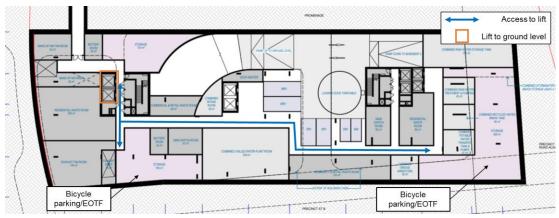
Bicycle parking and end of trip facilities - Building 2 and 3 Basement Level 2
